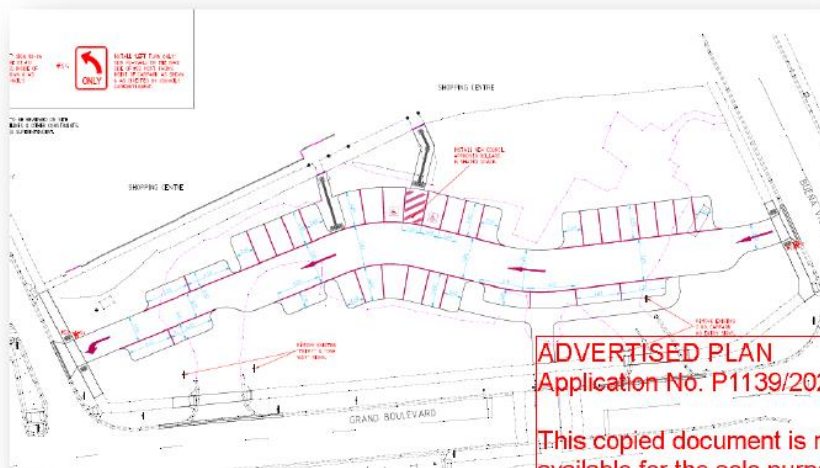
Extract from plans showing the proposed Grand Boulevard car parking layout
